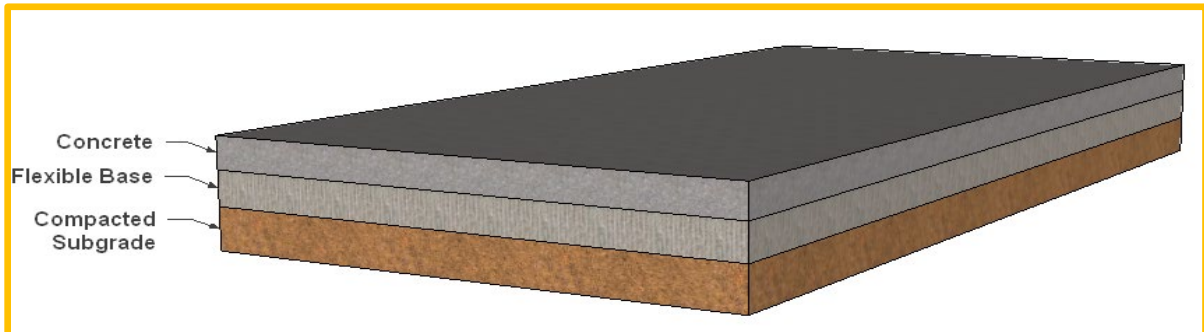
RIGID PAVEMENT TYPICAL SECTION
